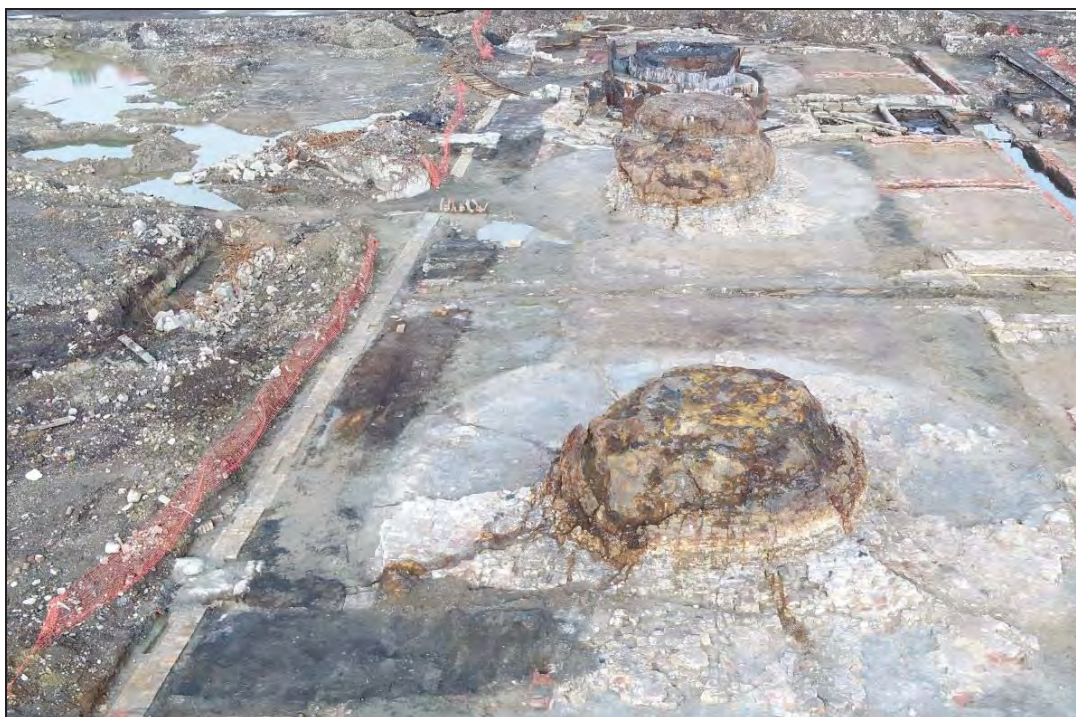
Overview of rail line G8: view north-northwest. 2m scale (Archive Photo Ref. D168)
